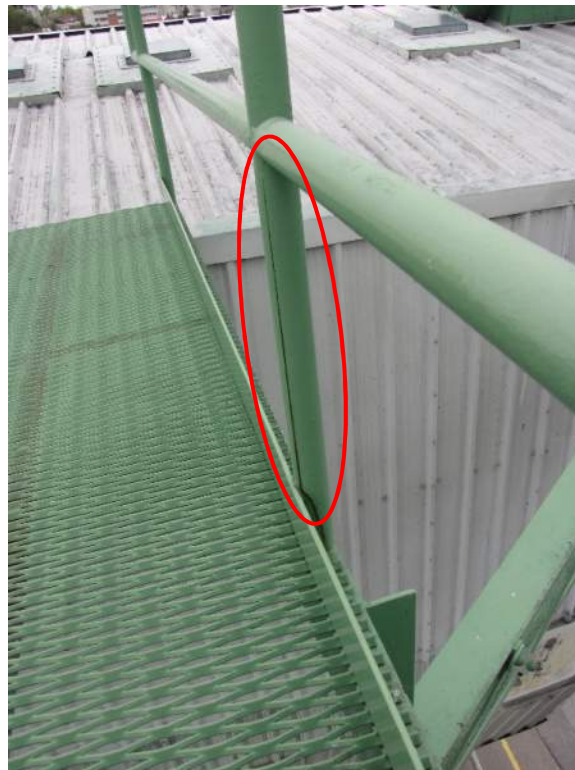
Several catwalk railing posts have split (second post from west of counterweight catwalk 21-27 north railing shown).
